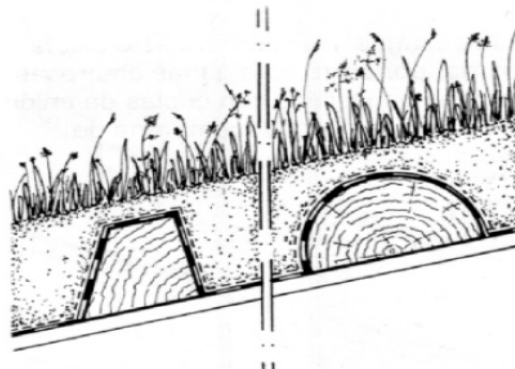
Barriers to avoid landslide in high slope and sloped green roofs (Minke, 2004).
